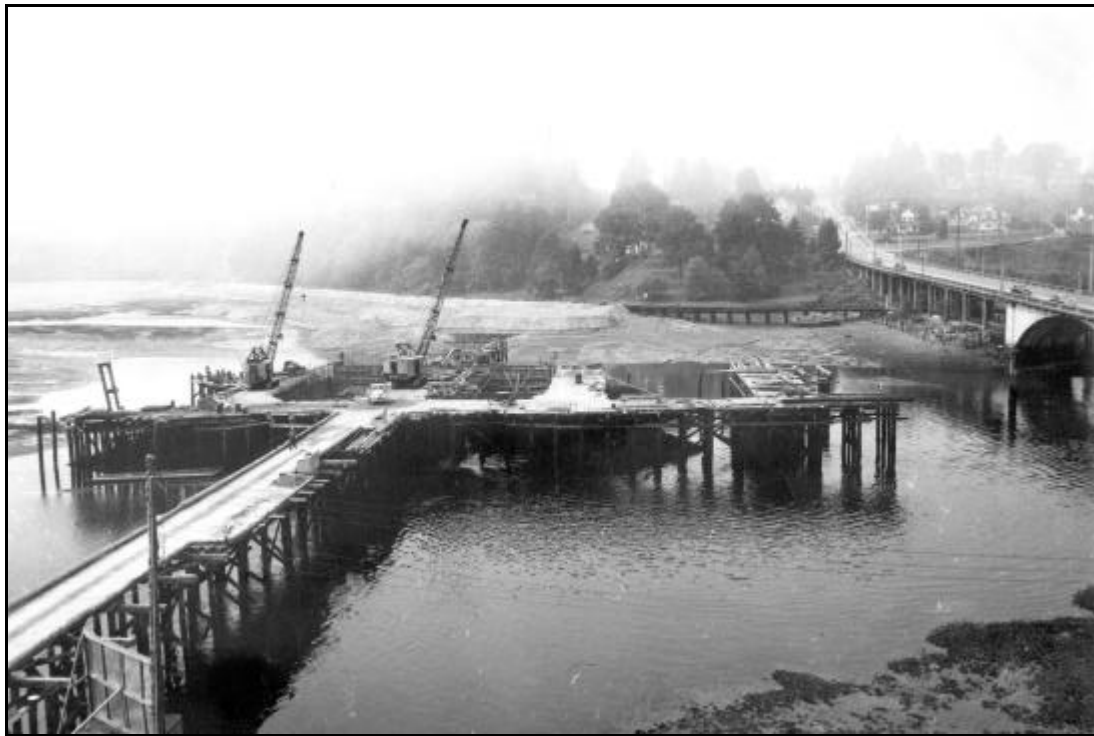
Construction platform for the Capitol Lake Dam. c. 1951.
